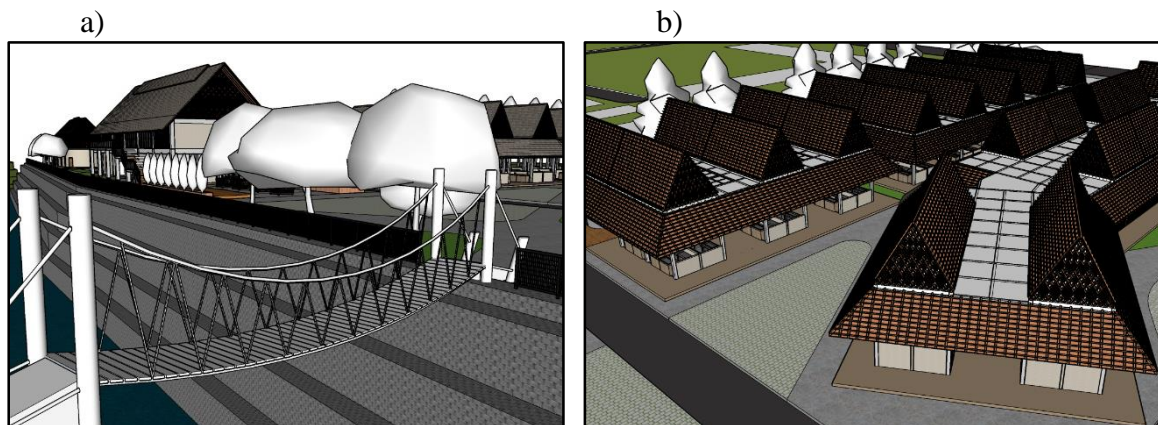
(a) Retaining Wall; (b) Wooden Roof Plan with Concrete Roofing
